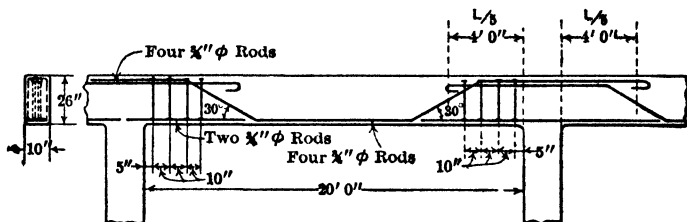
Typical Design of a Fully-Continuous Rectangular Beam
